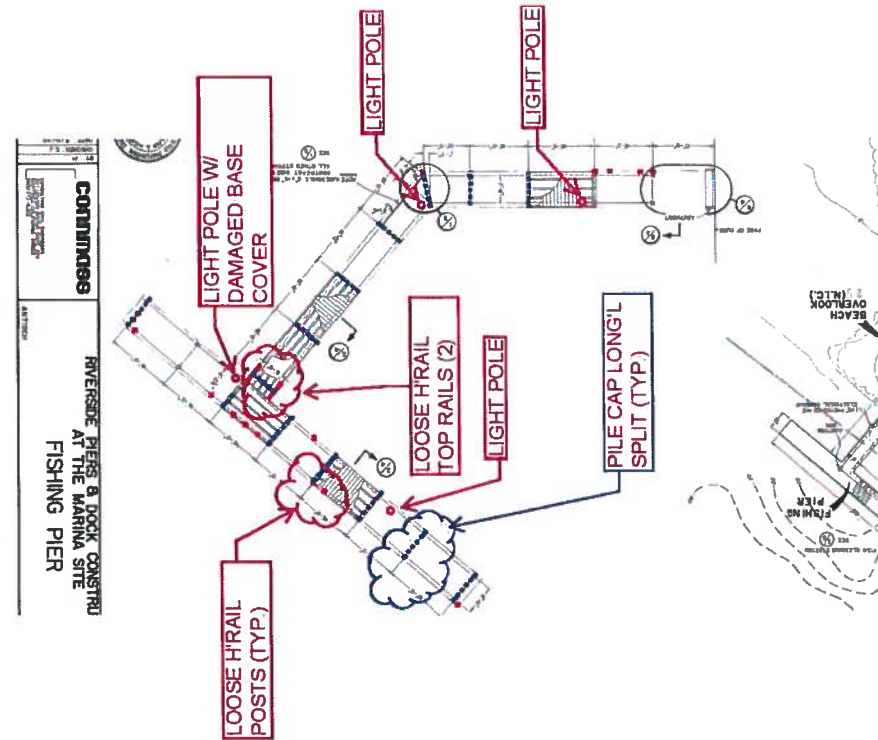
Marina Fishing Pier Framing Plan and Damage Locations
